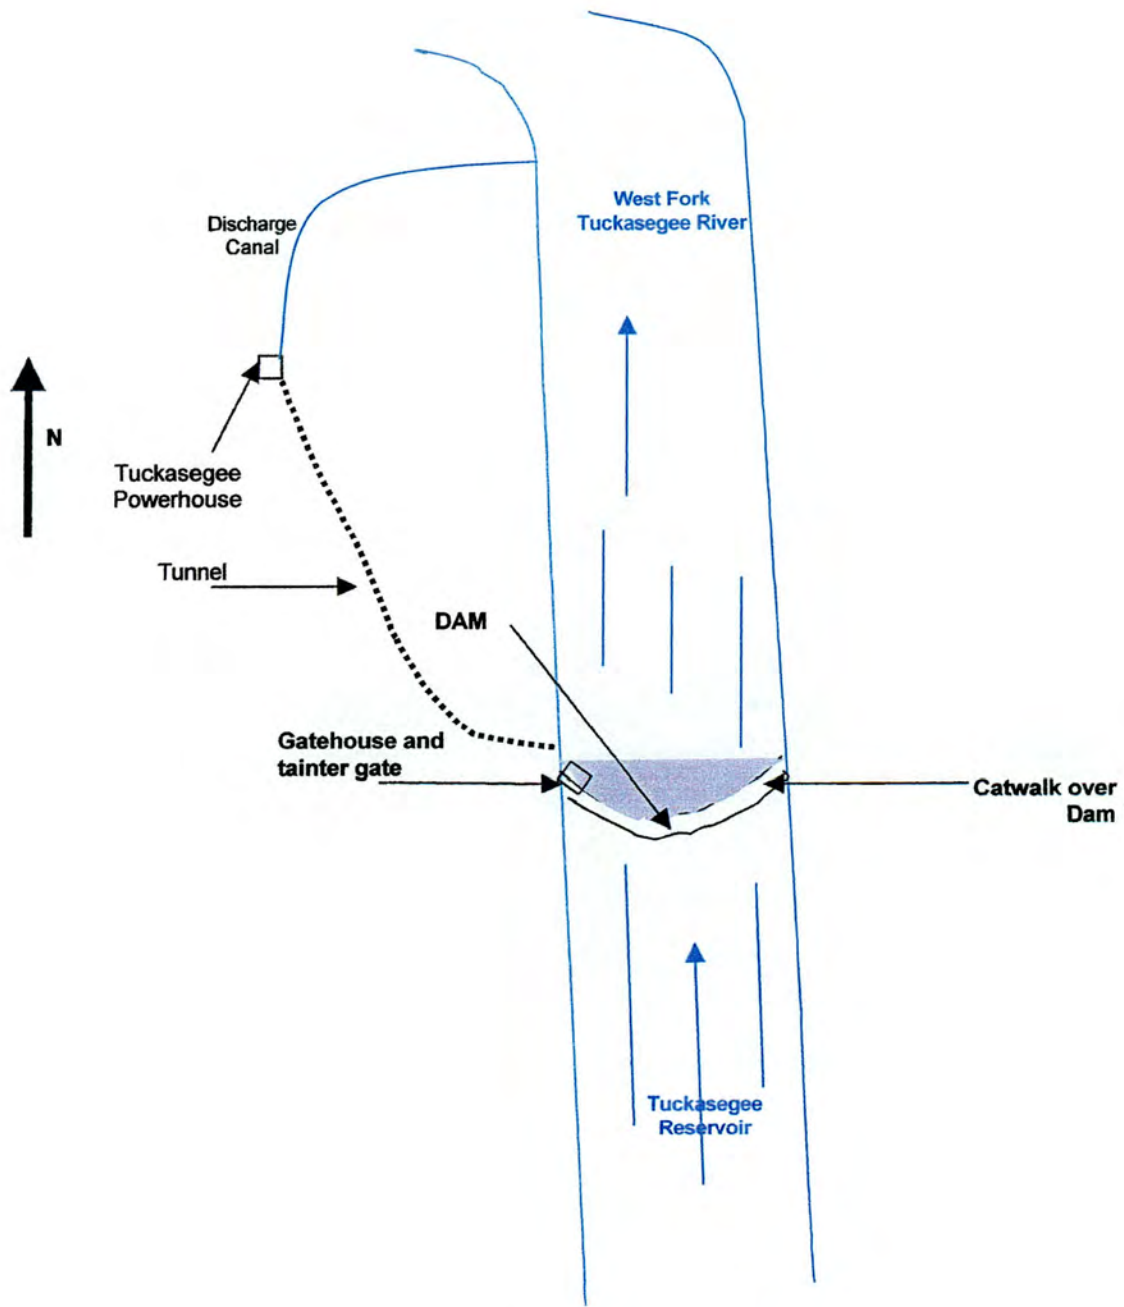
Tuckasegee Dam and Powerhouse Site Plan.
